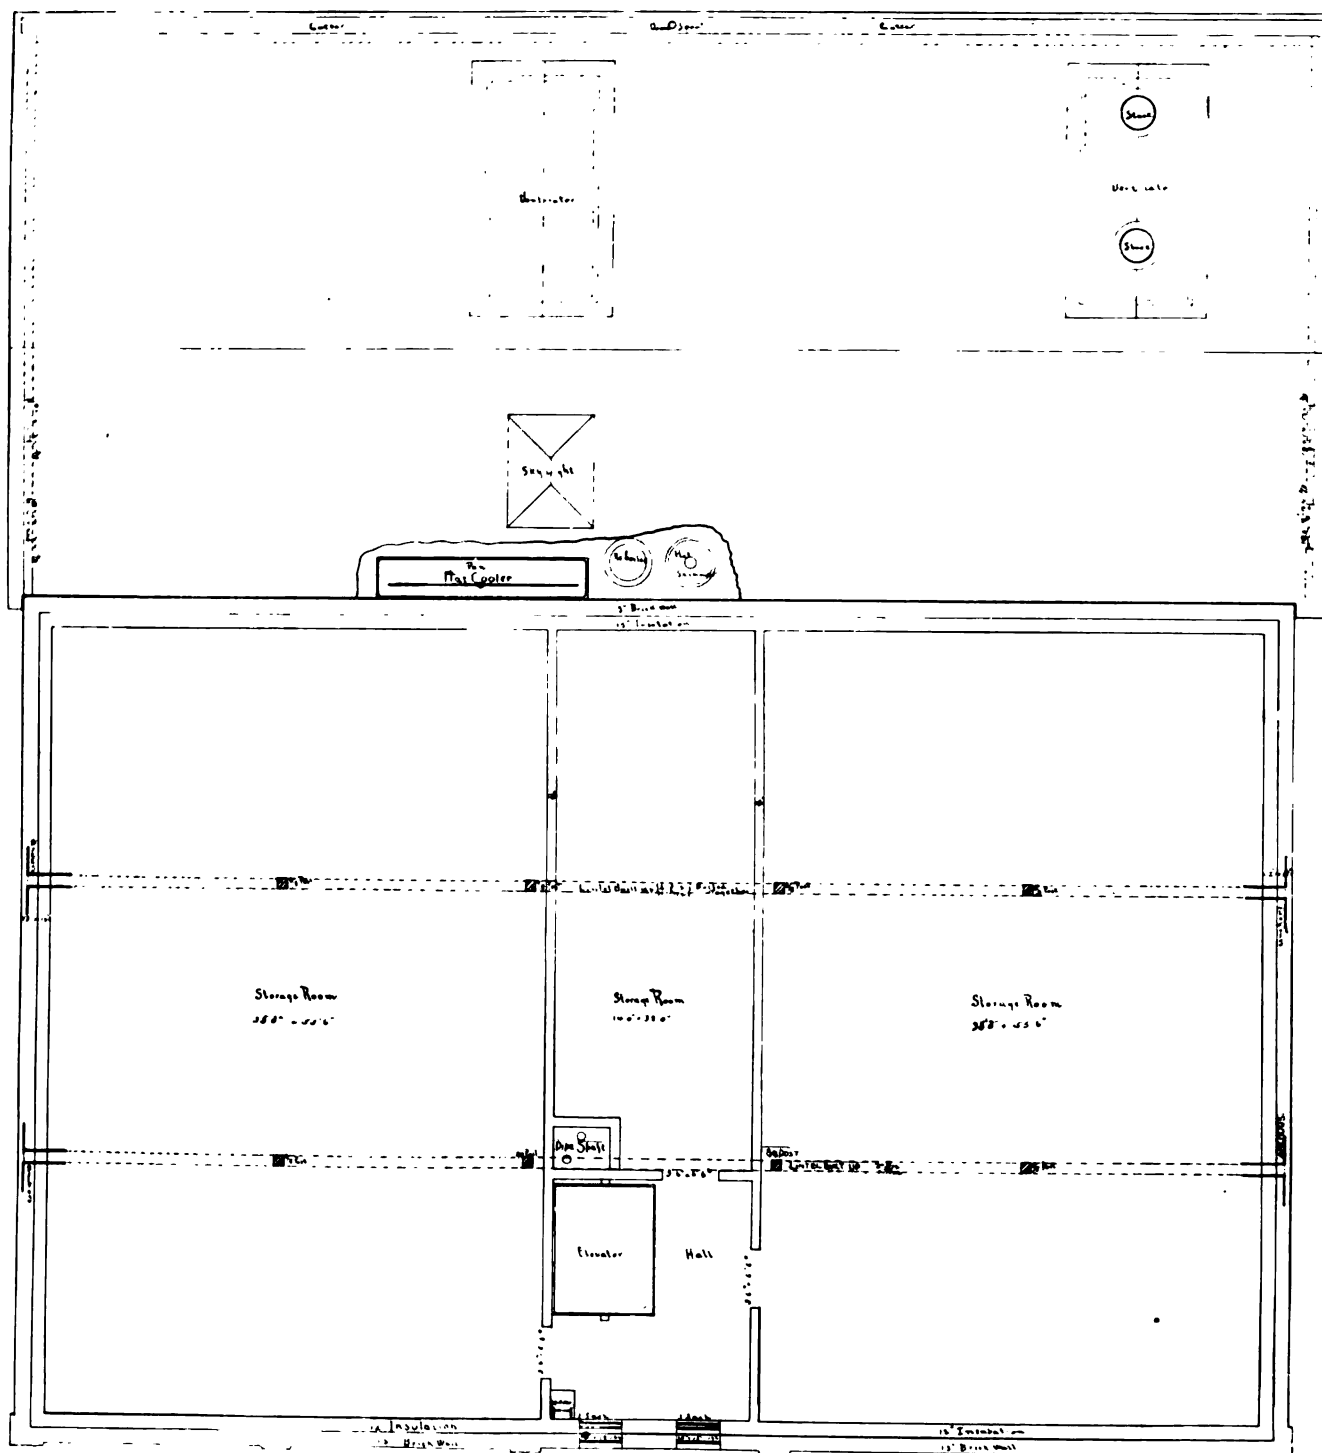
SECOND FLOOR PLAN, TOLEDO COLD STORAGE CO.'S NEW WAREHOUSE, TOLEDO, OHIO.
